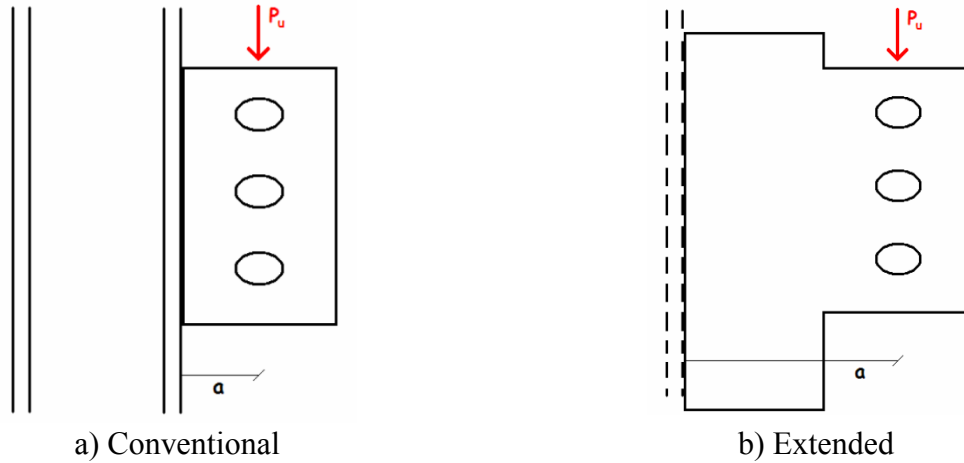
Conventional vs. Extended Unstiffened Beam-to-Column Shear Tab Connections, Goodrich (2005)
